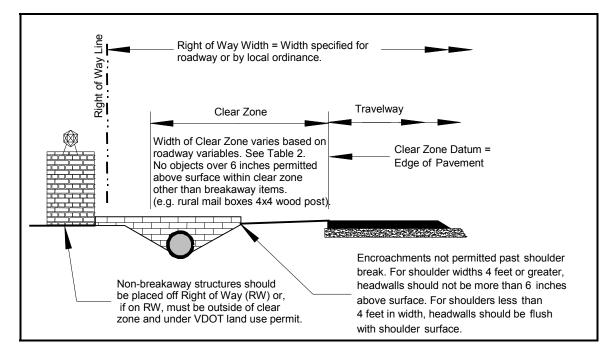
SETBACK DETAILS WITH SHOULDER AND DITCH
